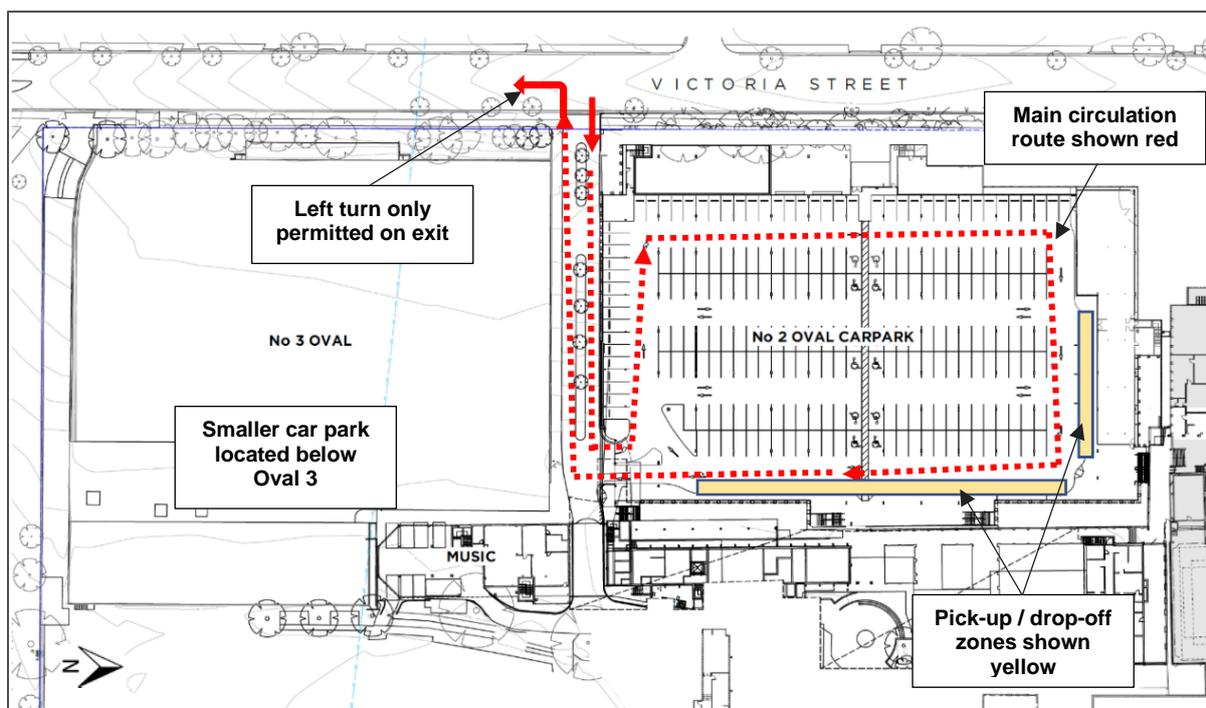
| Existing main car park layout (Source: Applicant's EIS 2020)
